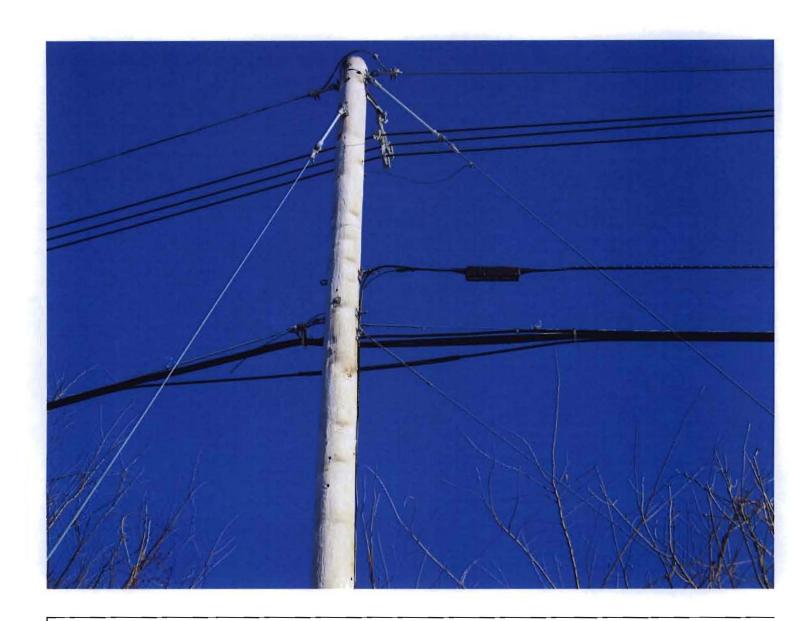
Looking North showing both electrical circuits and sag in relation to bridge.
